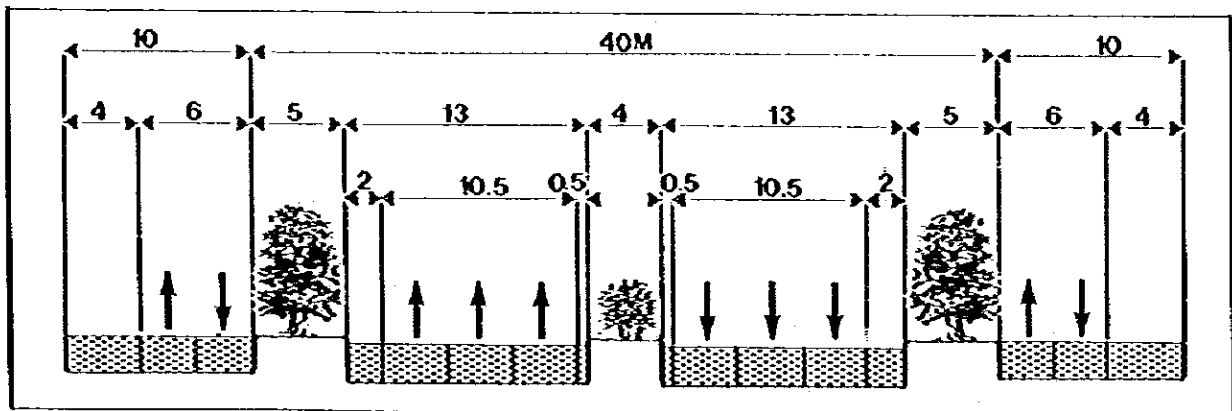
TYPICAL CROSS-SECTION OF JLN TABRAU (6-LANE)
